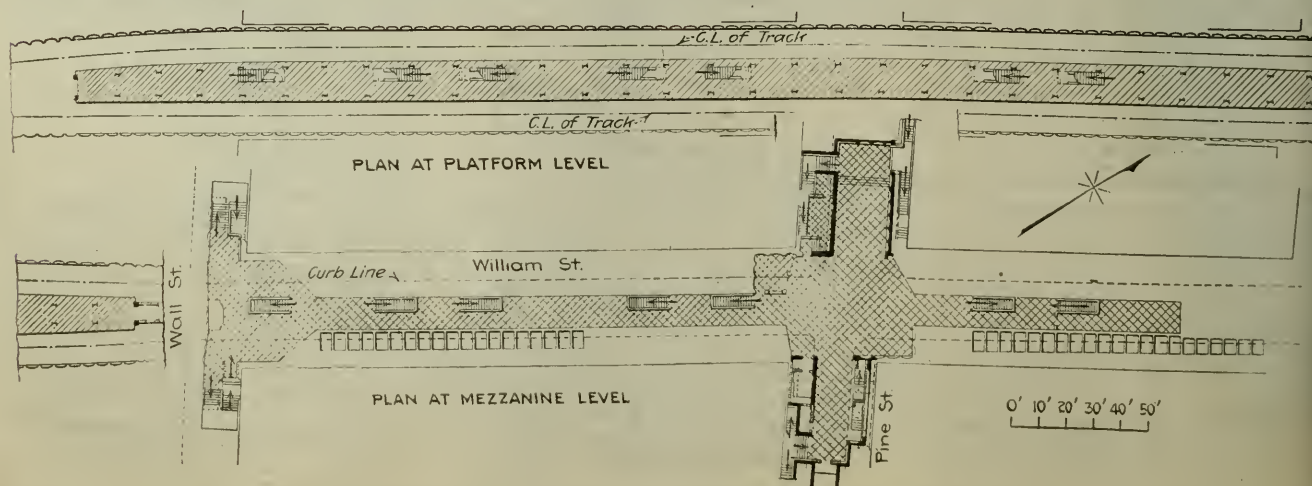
WALL STREET STATION, NEW YORK SUBWAY
